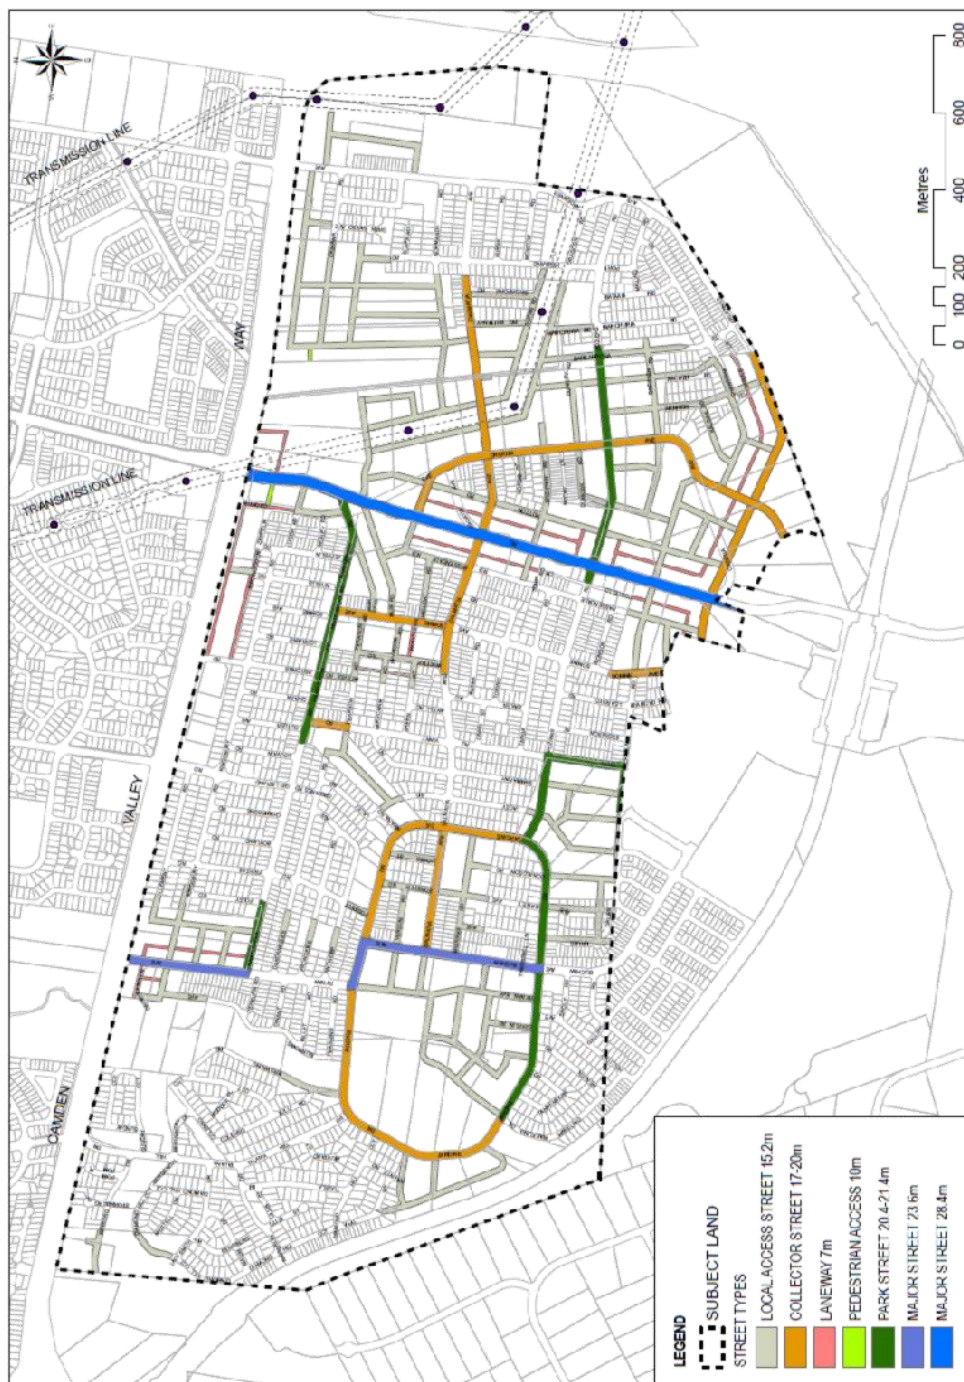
Street Types *This figure has been amended to reflect the new road layout in the vicinity of Maxwells Creek North Riparian Park. This includes the addition of two 10m wide pedestrian access ways leading to the park, as detailed within Council report dated 26 June 2018.
